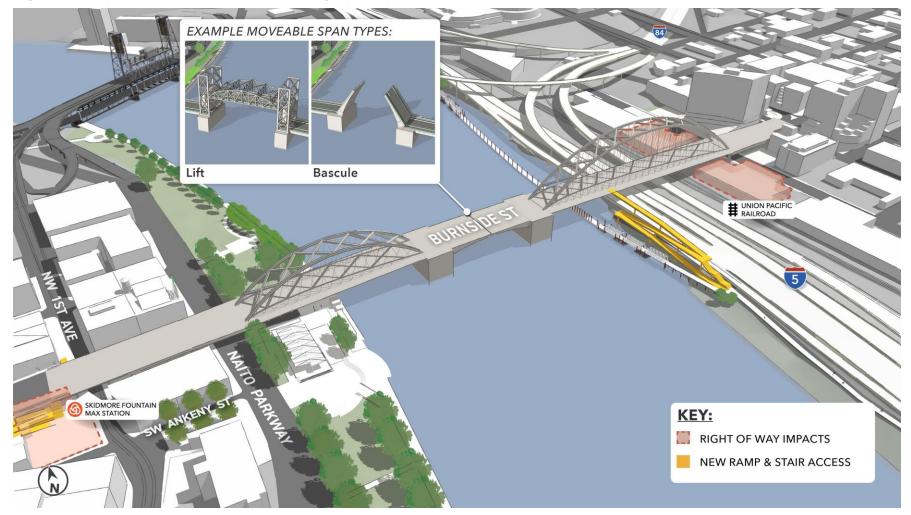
Replacement Alternative with Long-Span Approach – Aerial View
